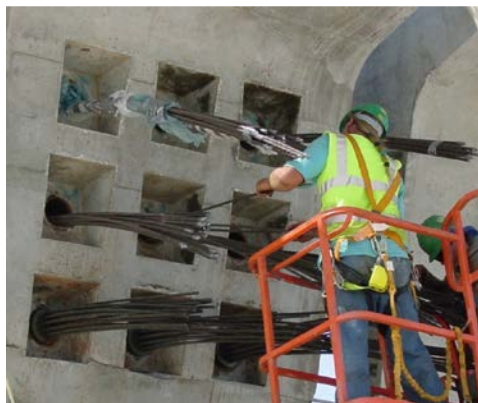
Precast concrete bridge segment with PT ducts and tendons shown [Hamilton 2014].
